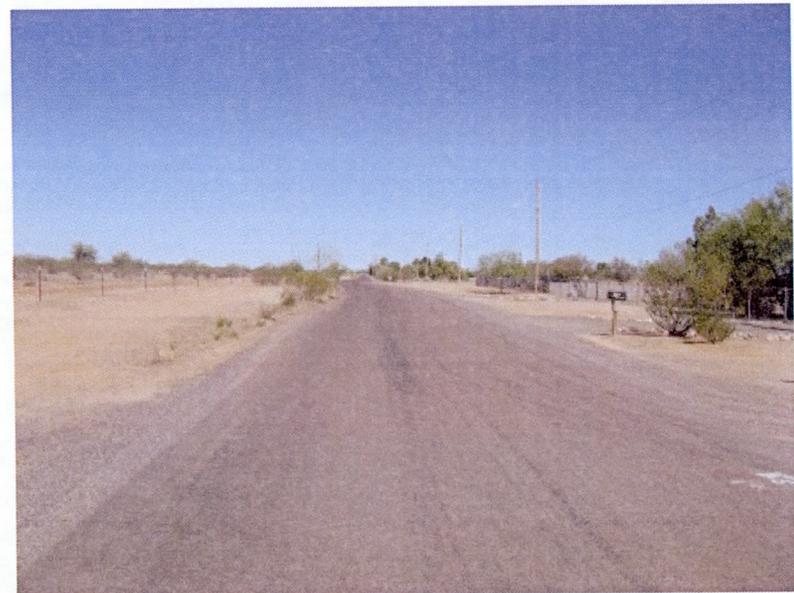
At the intersection of Norwich Drive and Balfour Blvd. looking west along Norwich Drive.
